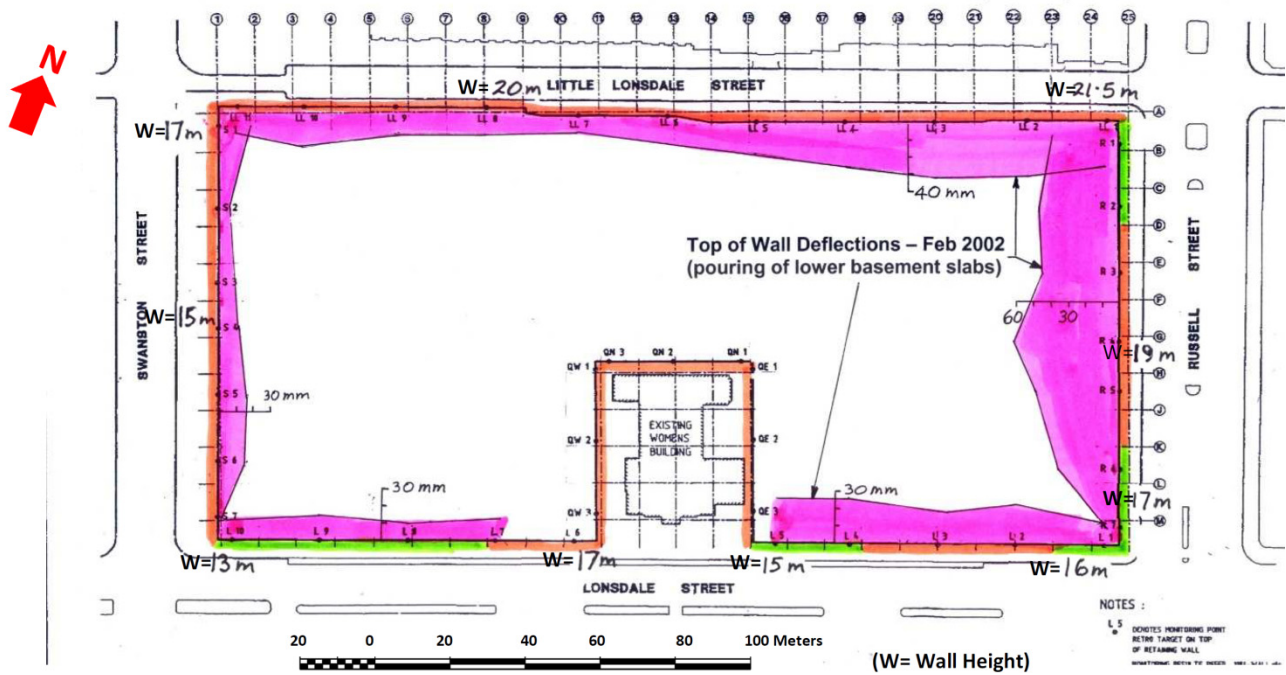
Top of Wall Lateral Movements at Start of Pouring Lower Basement Slab
